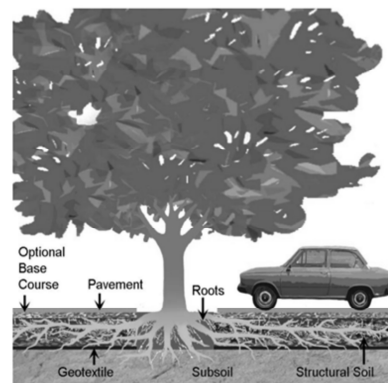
This system both serves as a parking lot and as a stormwater management facility. In addition to this double use of space, the structural soils also provide vastly greater soil volumes for tree root growth than traditional parking lot construction.
